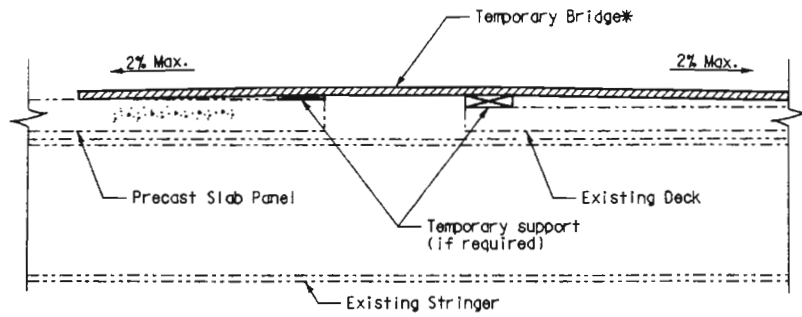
DETAIL OF TEMPORARY WORK PAD (AREA A)
